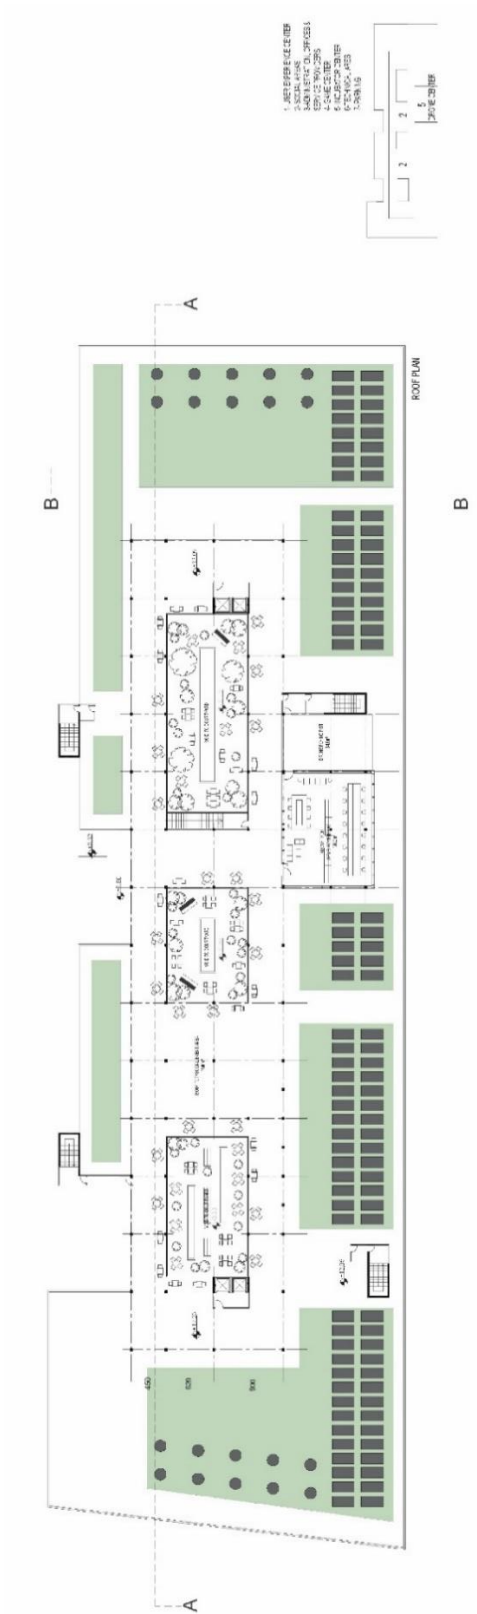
Roof top plan of Antalya Technology of Innovation Center.
